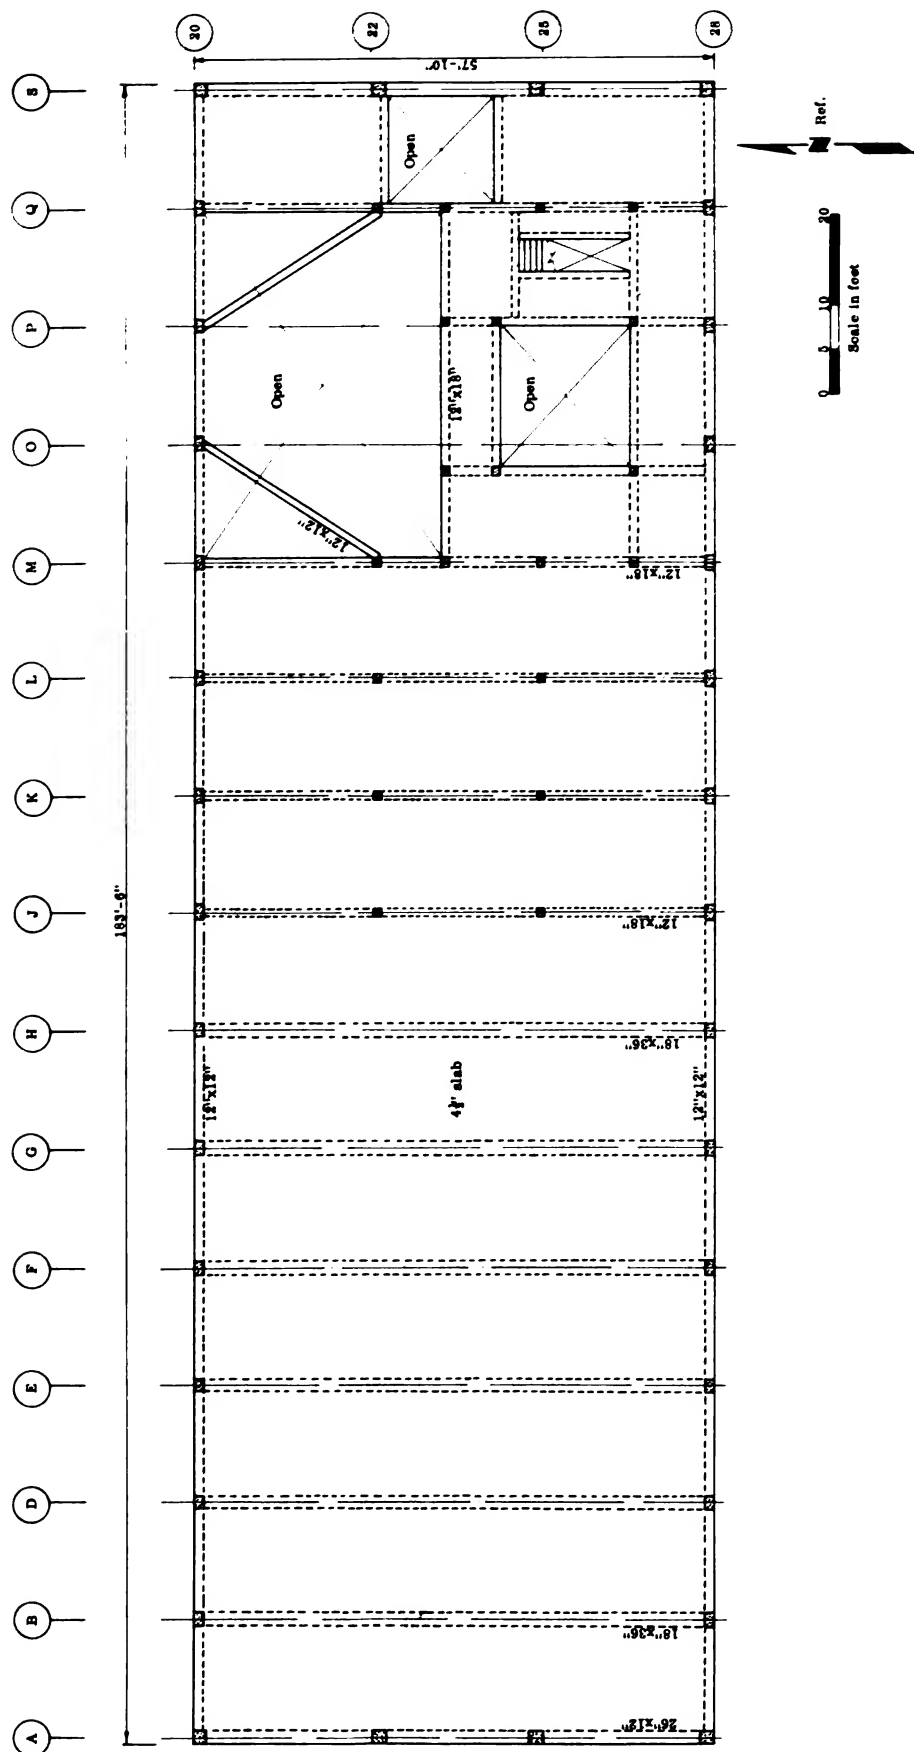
Sheraton-Universal Hotel. Roof framing plan.
